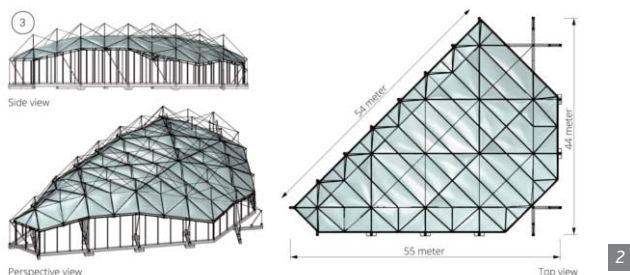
Drawings of the ETFE roof © Buitink Technology
